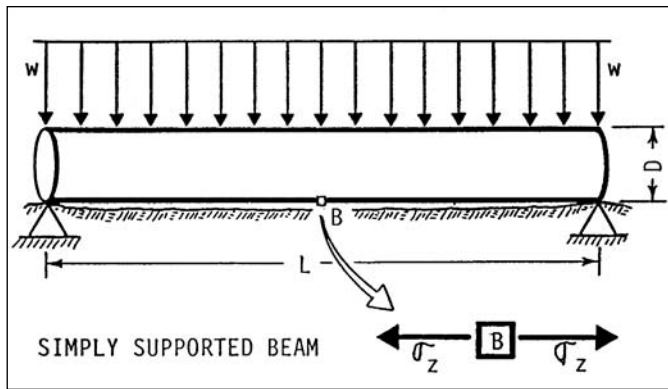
Beam loading for longitudinal stress analysis of a simply supported buried pipe section.
